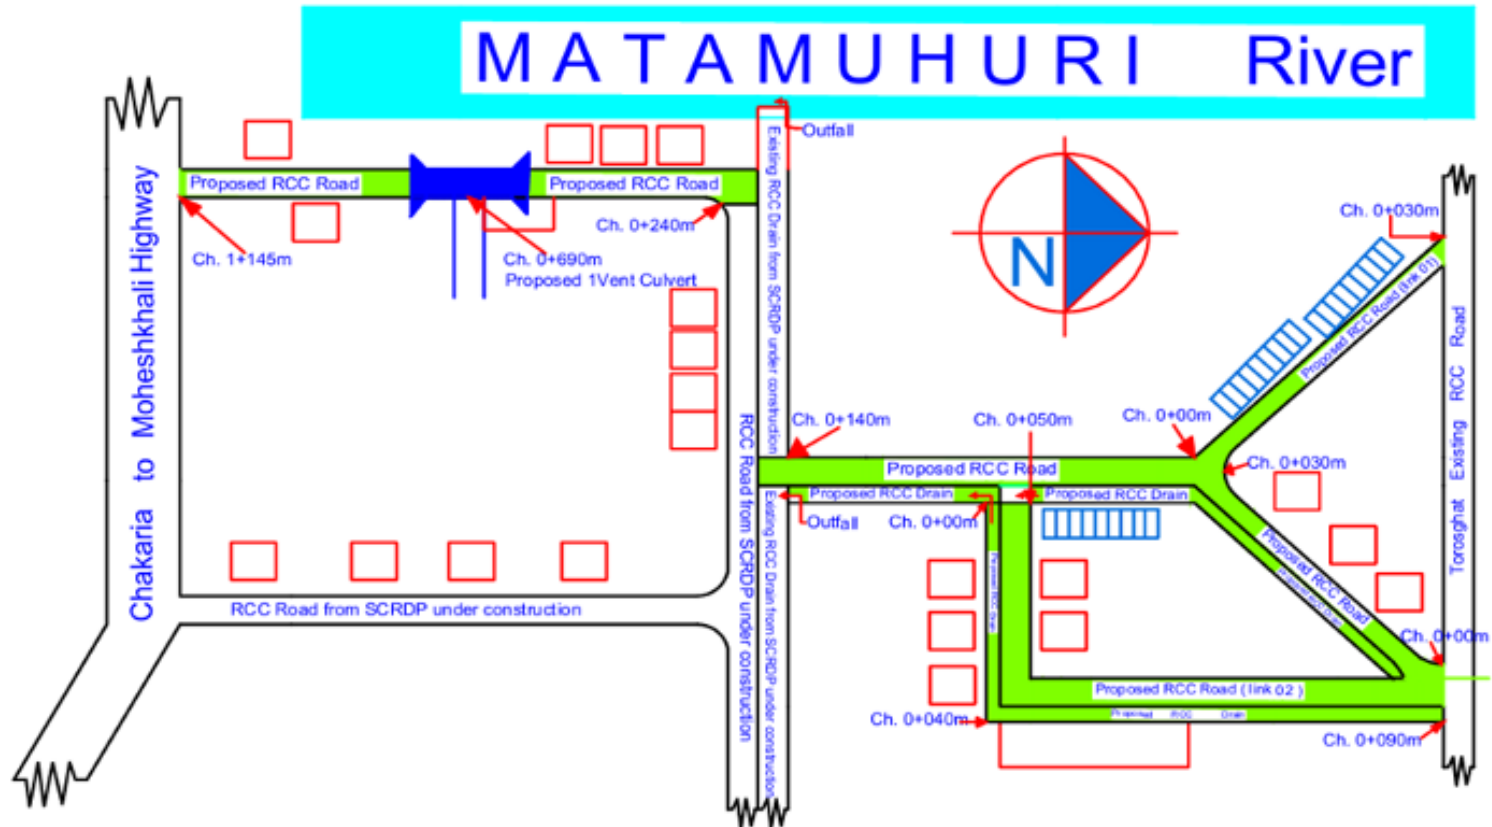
Zone Layout Plan of the Proposed Subproject Area (Road) and its Adjoining Roads with Influence Zone
